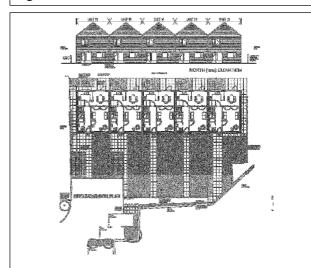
Proposed Floor Plan and Elevation of New Build Houses
